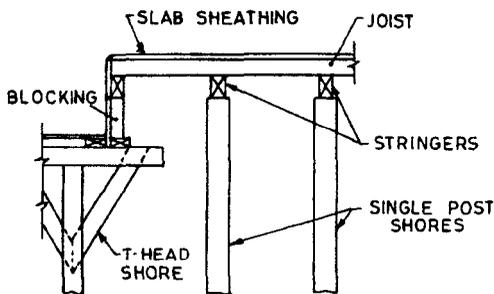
TYPICAL SLAB FORM RESTING ON BEAM LEDGER AND STRINGERS
